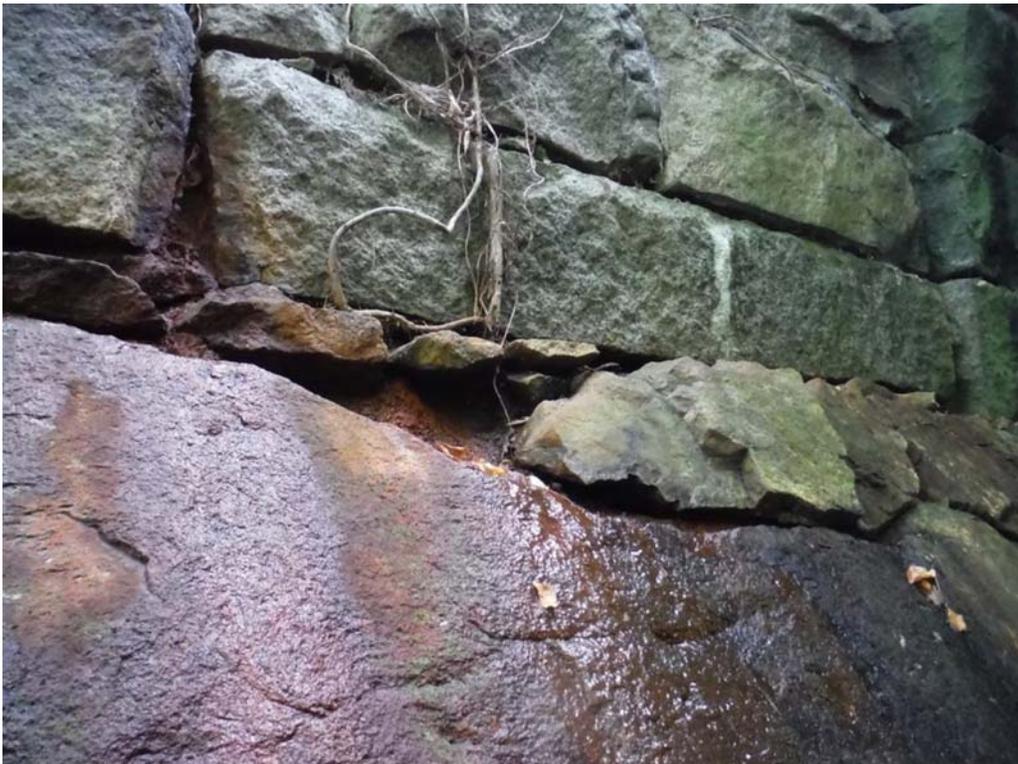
Cracked and missing stone directly below southeast wingwall
